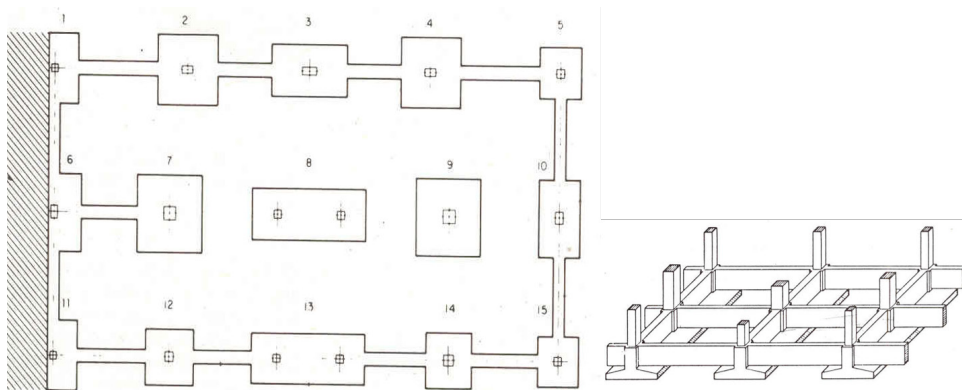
Footing. Interrelation between footings. Foundations plan. Design by Fernando Ripollés.
